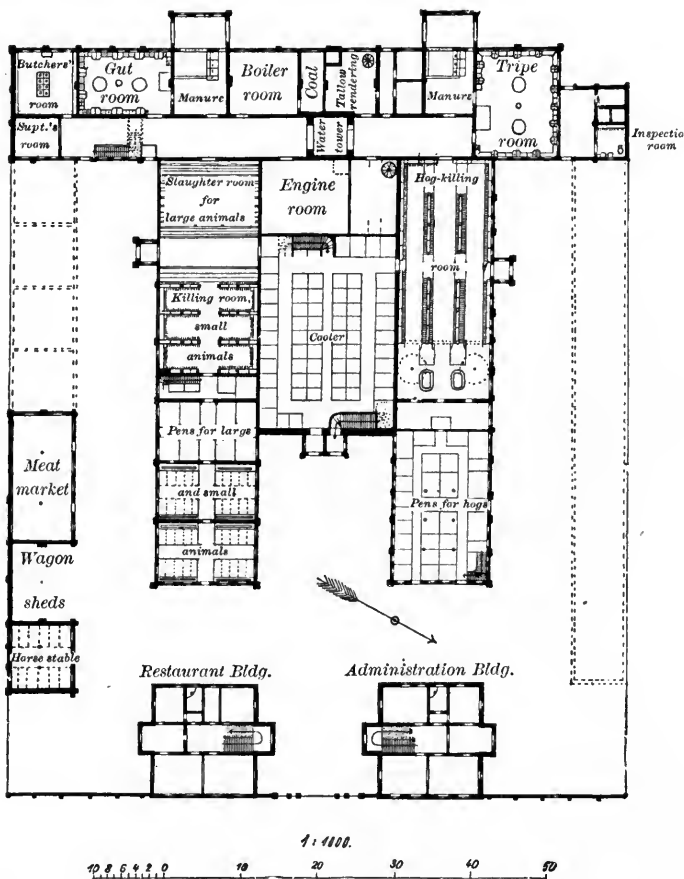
Ground plan of an abattoir (Tilsit) with German arrangement of the buildings.
